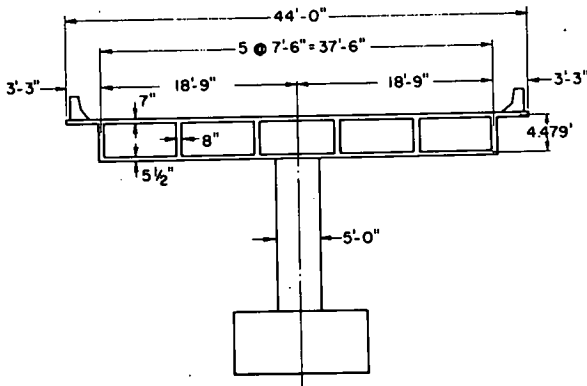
Cases 1-5, Part 2, Single-Column Bridge Cross Section
